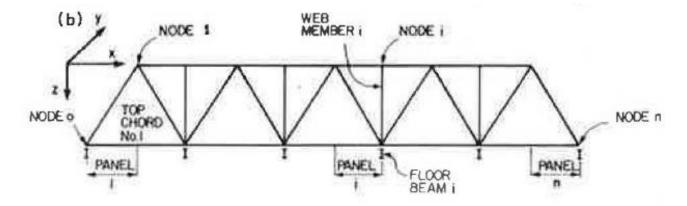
Truss Bridge (From Comp and Jackson 1977)
